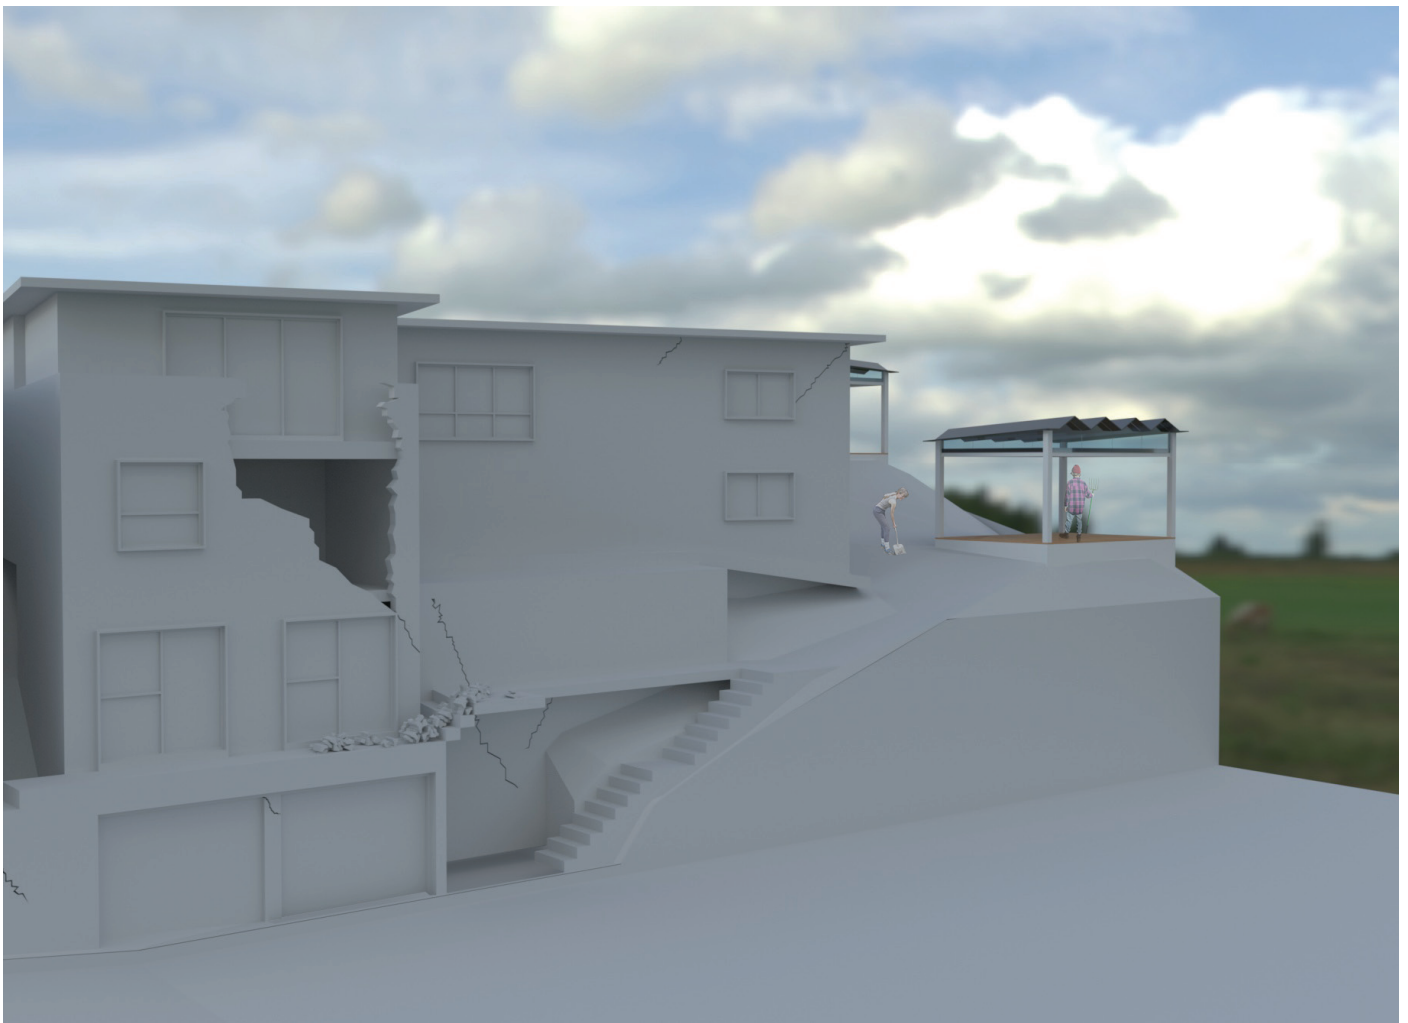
Day of a major earthquake. The transitional shelter is deployed without cladding panels, due to the volume of shelters required. As there are two houses on site, two shelters have been provided.
